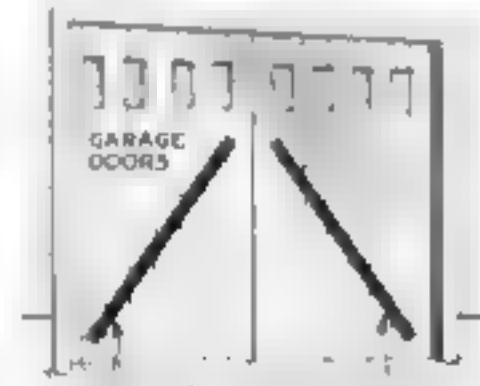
Metal bar braces bolted to your garage doors, as shown, reinforce the doors and prevent their sagging.
